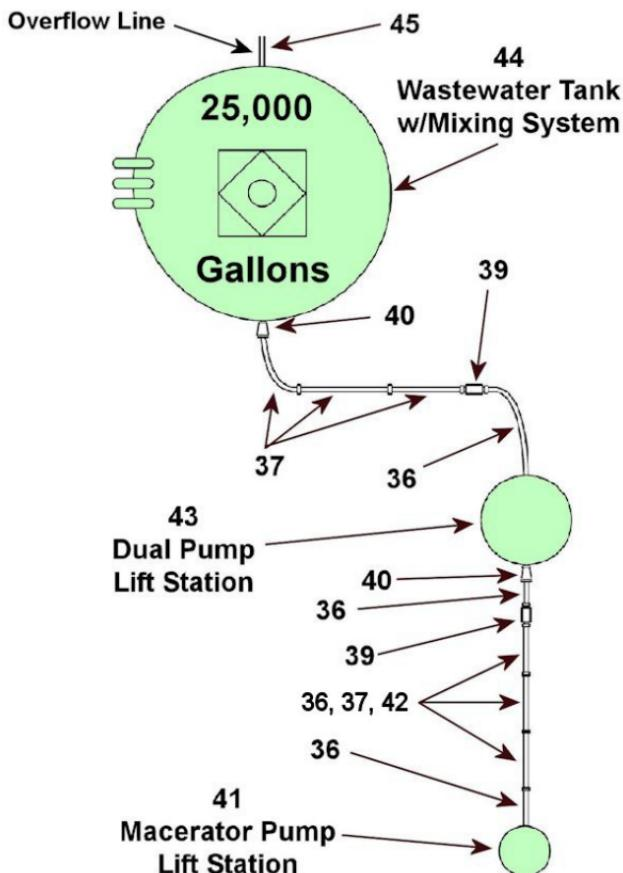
Latrine Wastewater Hose Component Layout.
